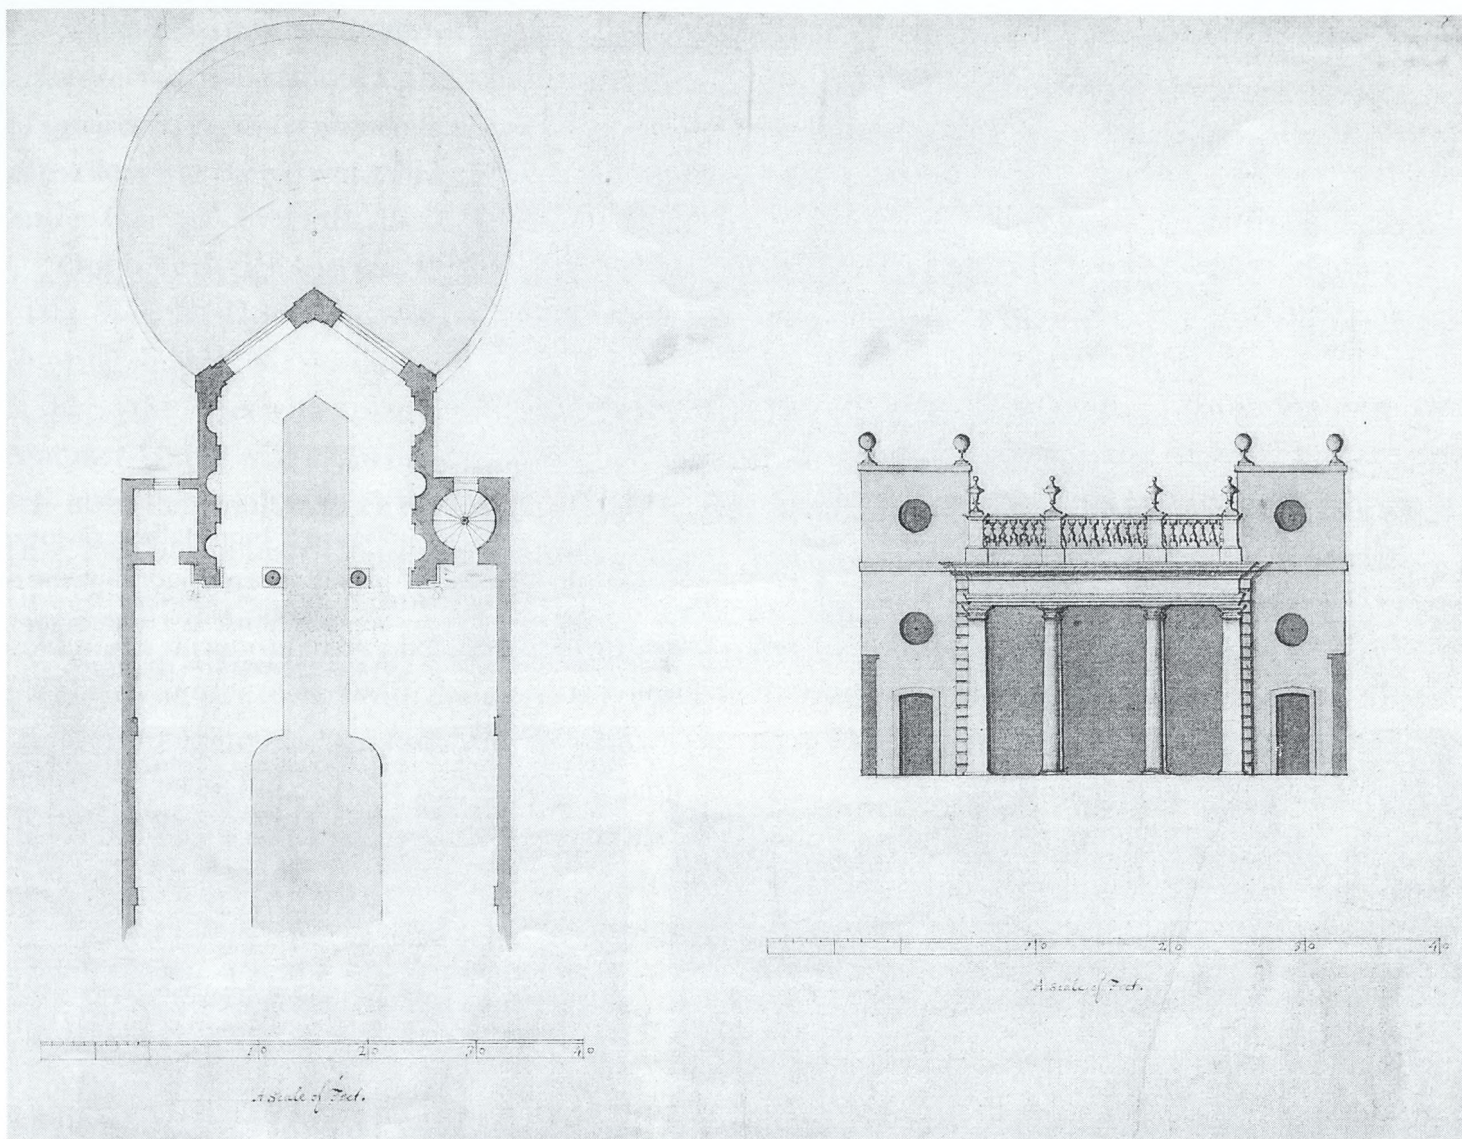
John Hallam, proposal drawing with a plan of east end of the cold bath and summer house and an elevation of the west side of the summer house, 1728. *Nottinghamshire Archives.
